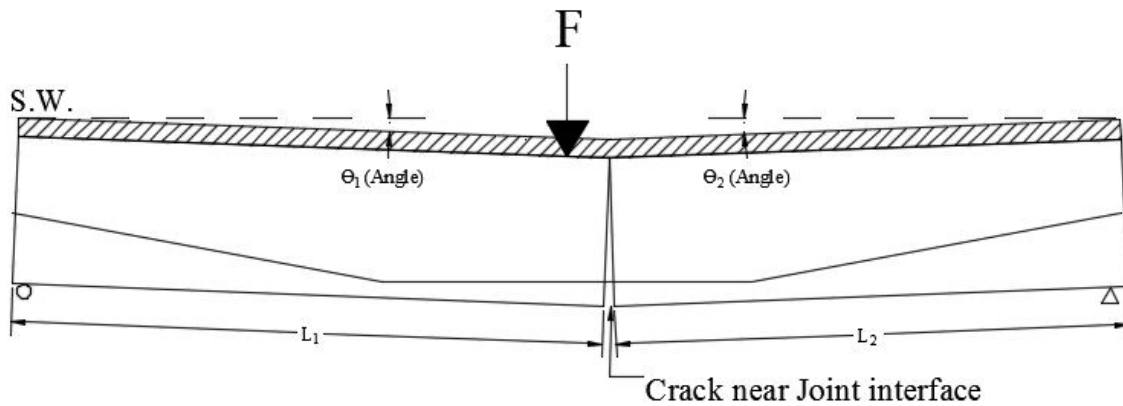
Hinging Mechanism of an Unbonded Segmental Post-Tensioned Girder
